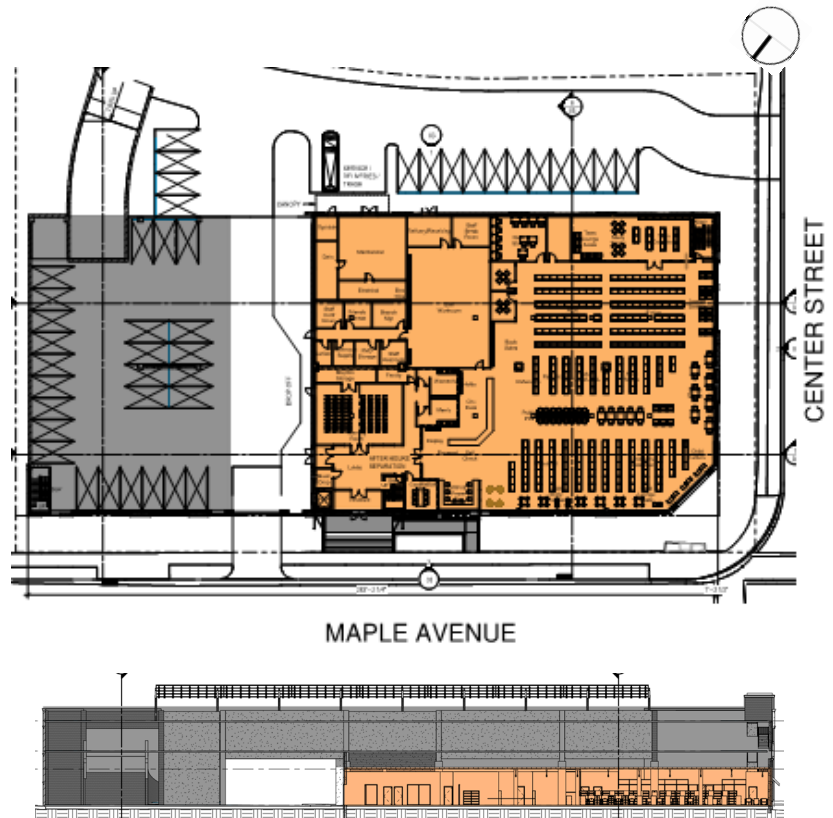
Option 2 Conceptual Massing Plan and Elevation (Maple Avenue)
